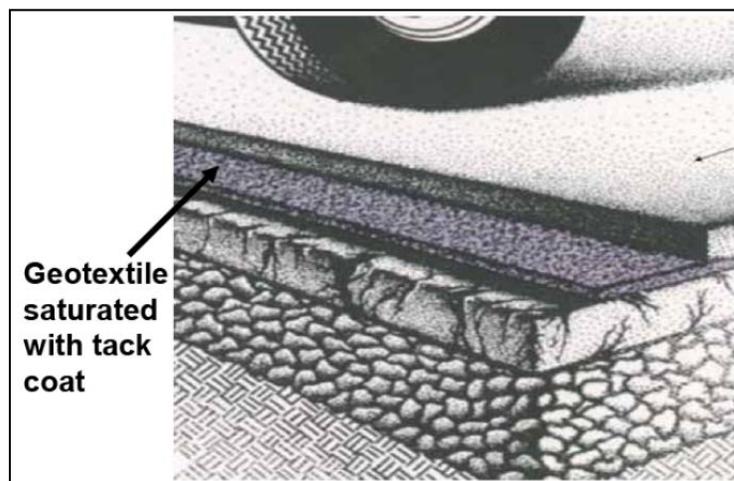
Geotextile used for mitigation of crack propagation into the pavement overlay
